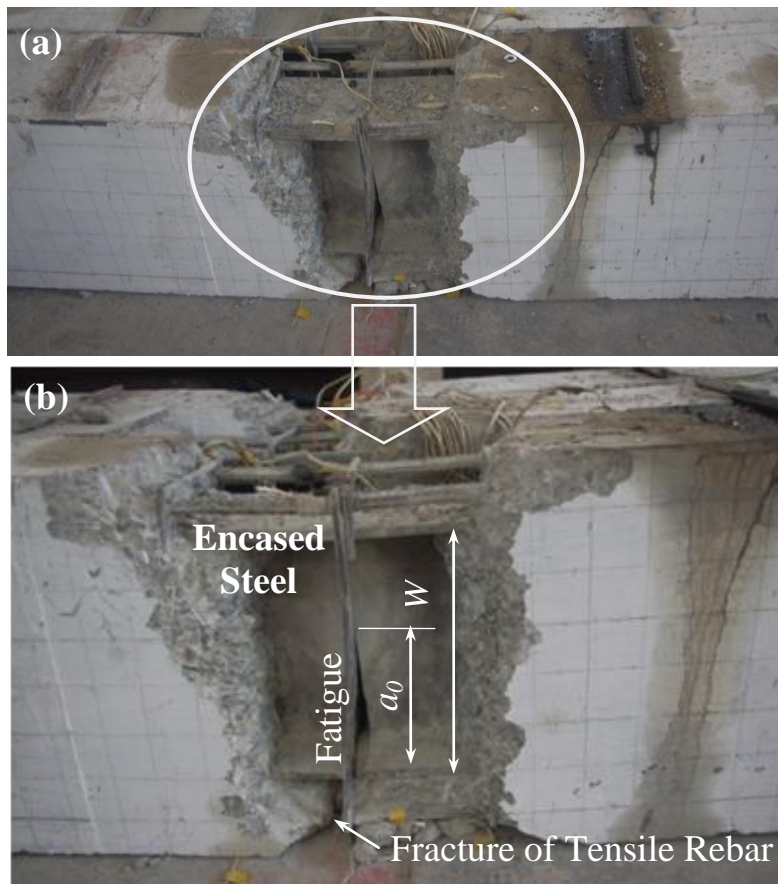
The fatigue damage of concrete- encased steel girders
